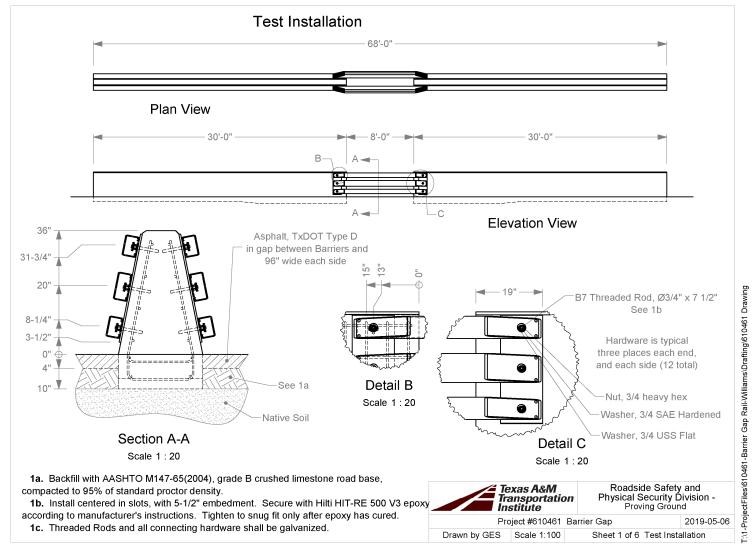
Details for Median Barrier Gap Design used in MASH Test 3-10 (Crash Test No. 610461-2).
